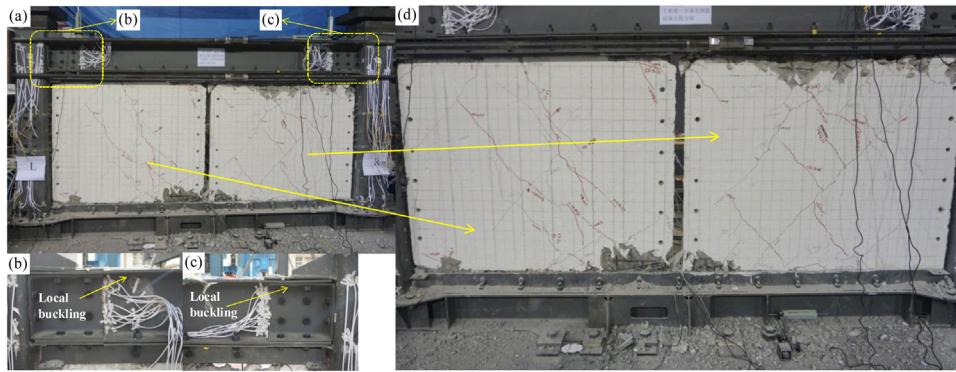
Failure patterns of the BF-BRW-A (a. final failure mode; b. local buckling at the left beam-to-column joint; c. local buckling at the right beam-to-column joint; failure mode of the BRW-A).
